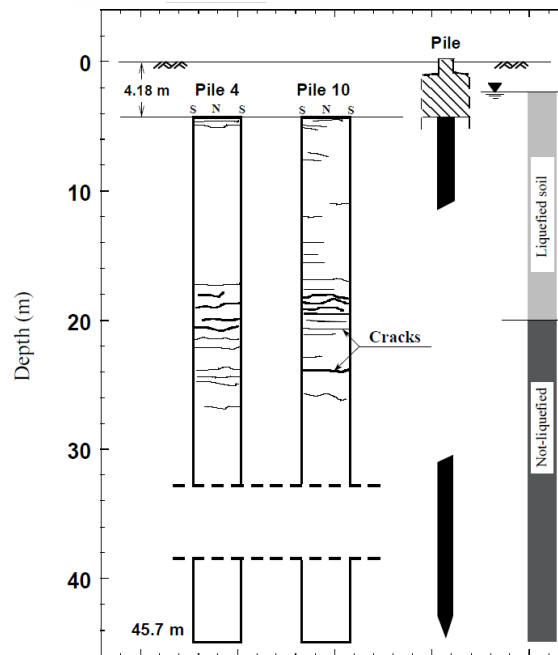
Development of cracks along the pile under Pier 211 of Uozakihamma Bridge (Amiri, 2008).
